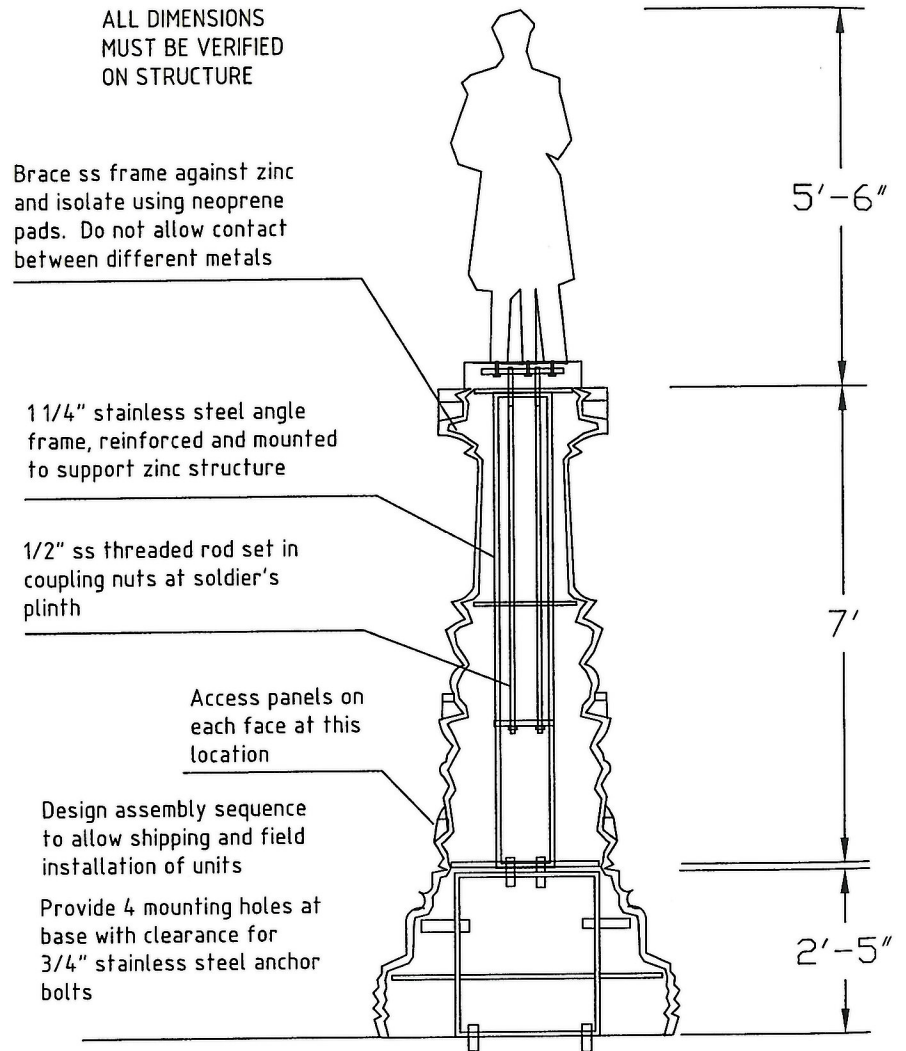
Section of Bardstown, KY, monument showing internal armature design. Conservation Solutions, Inc.
